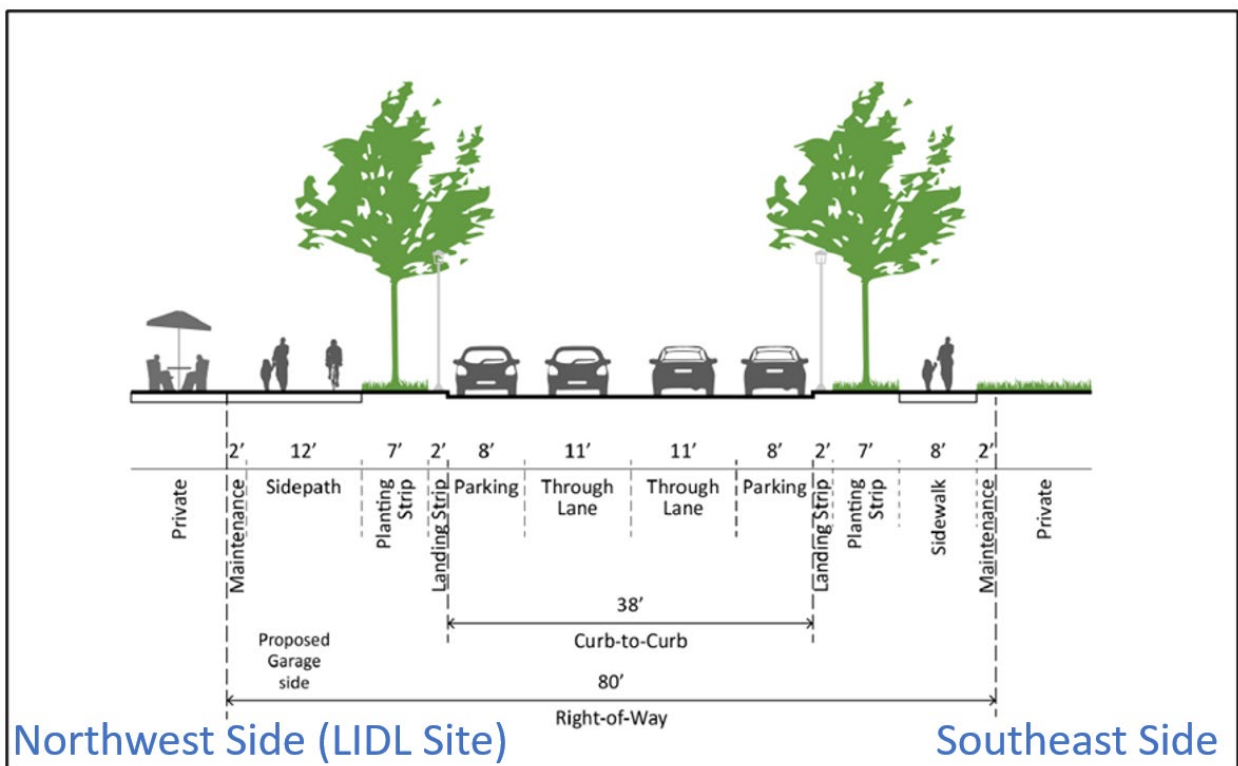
Sector Plan recommended Typical Street Section for Walter Johnson Road (Fig.47)
